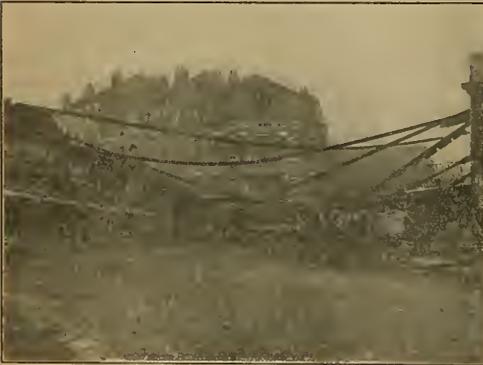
A Destroyed Steel Railway Bridge at Lille
